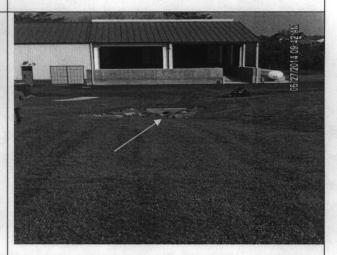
Drainage area to Outfall 001. Storm water flow enters the culvert (noted by the arrow) and travels underground until discharge. The sludge bay is in the background.
